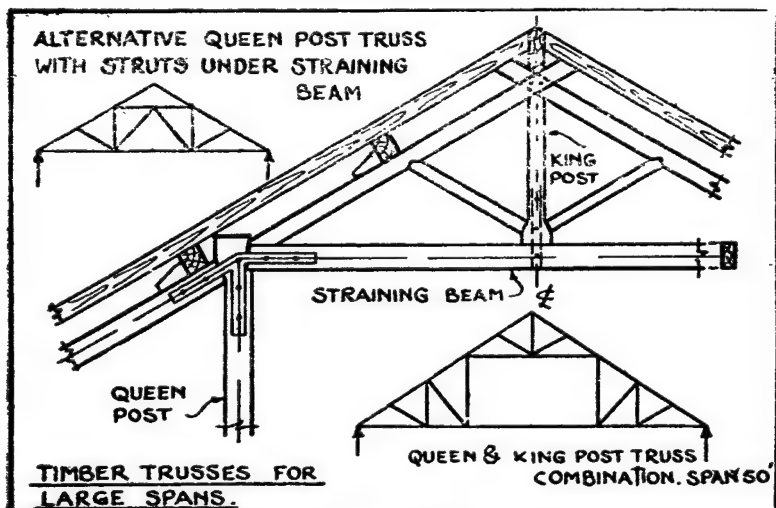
Detail of a queen post truss and the method of fixing purlins and common rafters.
